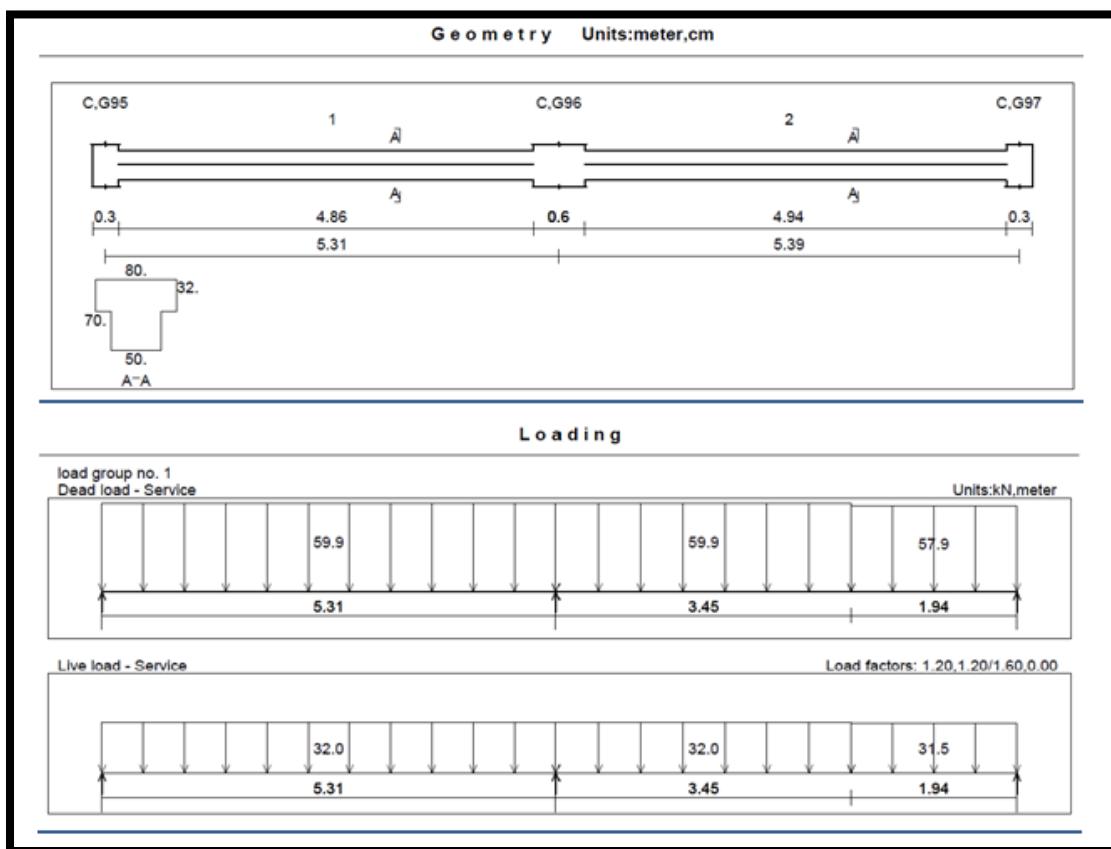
Statically System and Loads Distribution of Beam (B,G59).
